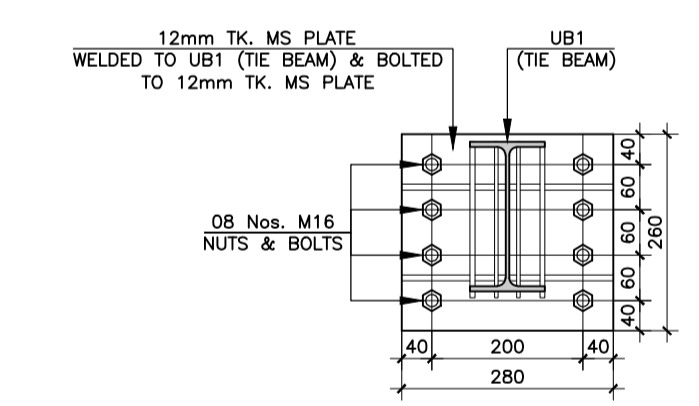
m TK. MS PLATE (REFER PLAN VIEW-B)
